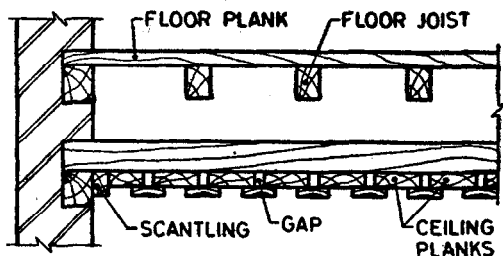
CLOSED CEILING INDEPENDENT BELOW FLOOR JOISTS
